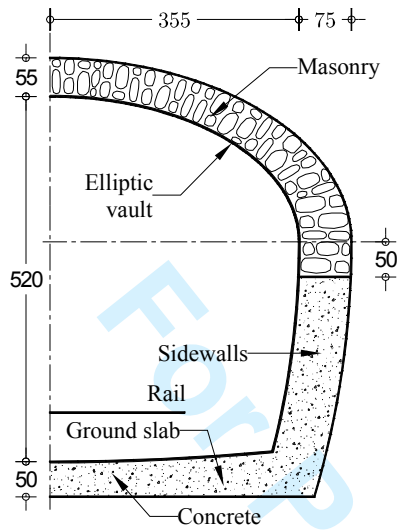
Typical section of a tunnel of the Paris subway system and constitutive materials (in cm)
